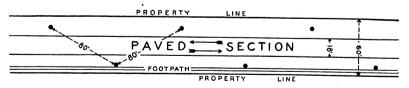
A 60-foot right-of-way with an 18-foot improved road and rows of formally planted trees 40 feet apart. The trees that are nearest each other are 80 feet apart.
